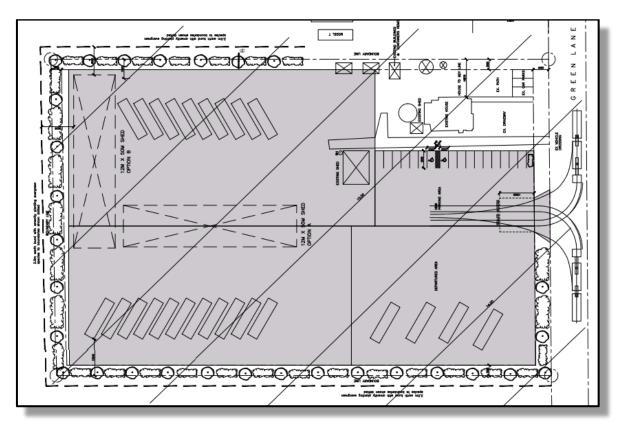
Proposed Site Layout (Source: Contour Architecture)
